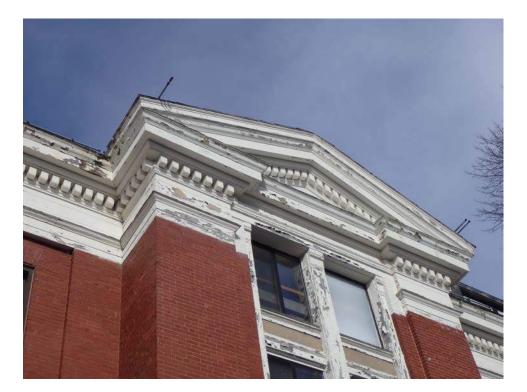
Snow rails loose from bracket and projecting beyond roof edge
